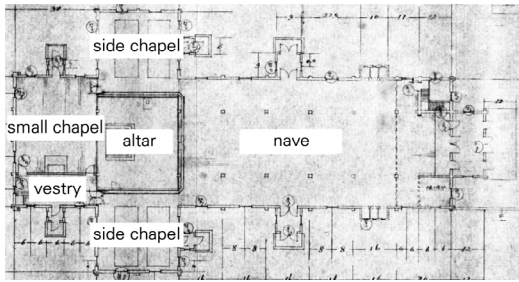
First floor plan drawing of Naedeok-dong cathedral source: [19]
